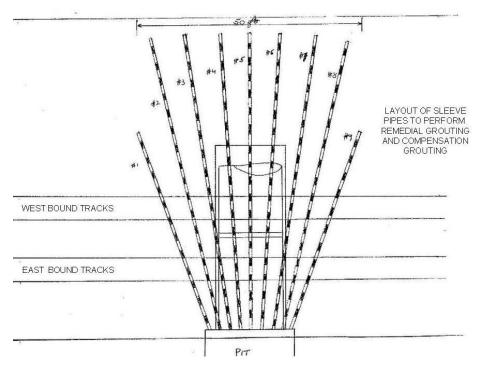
Schematic layout of the sleeve pipes fanning over the tunnel trajectory
